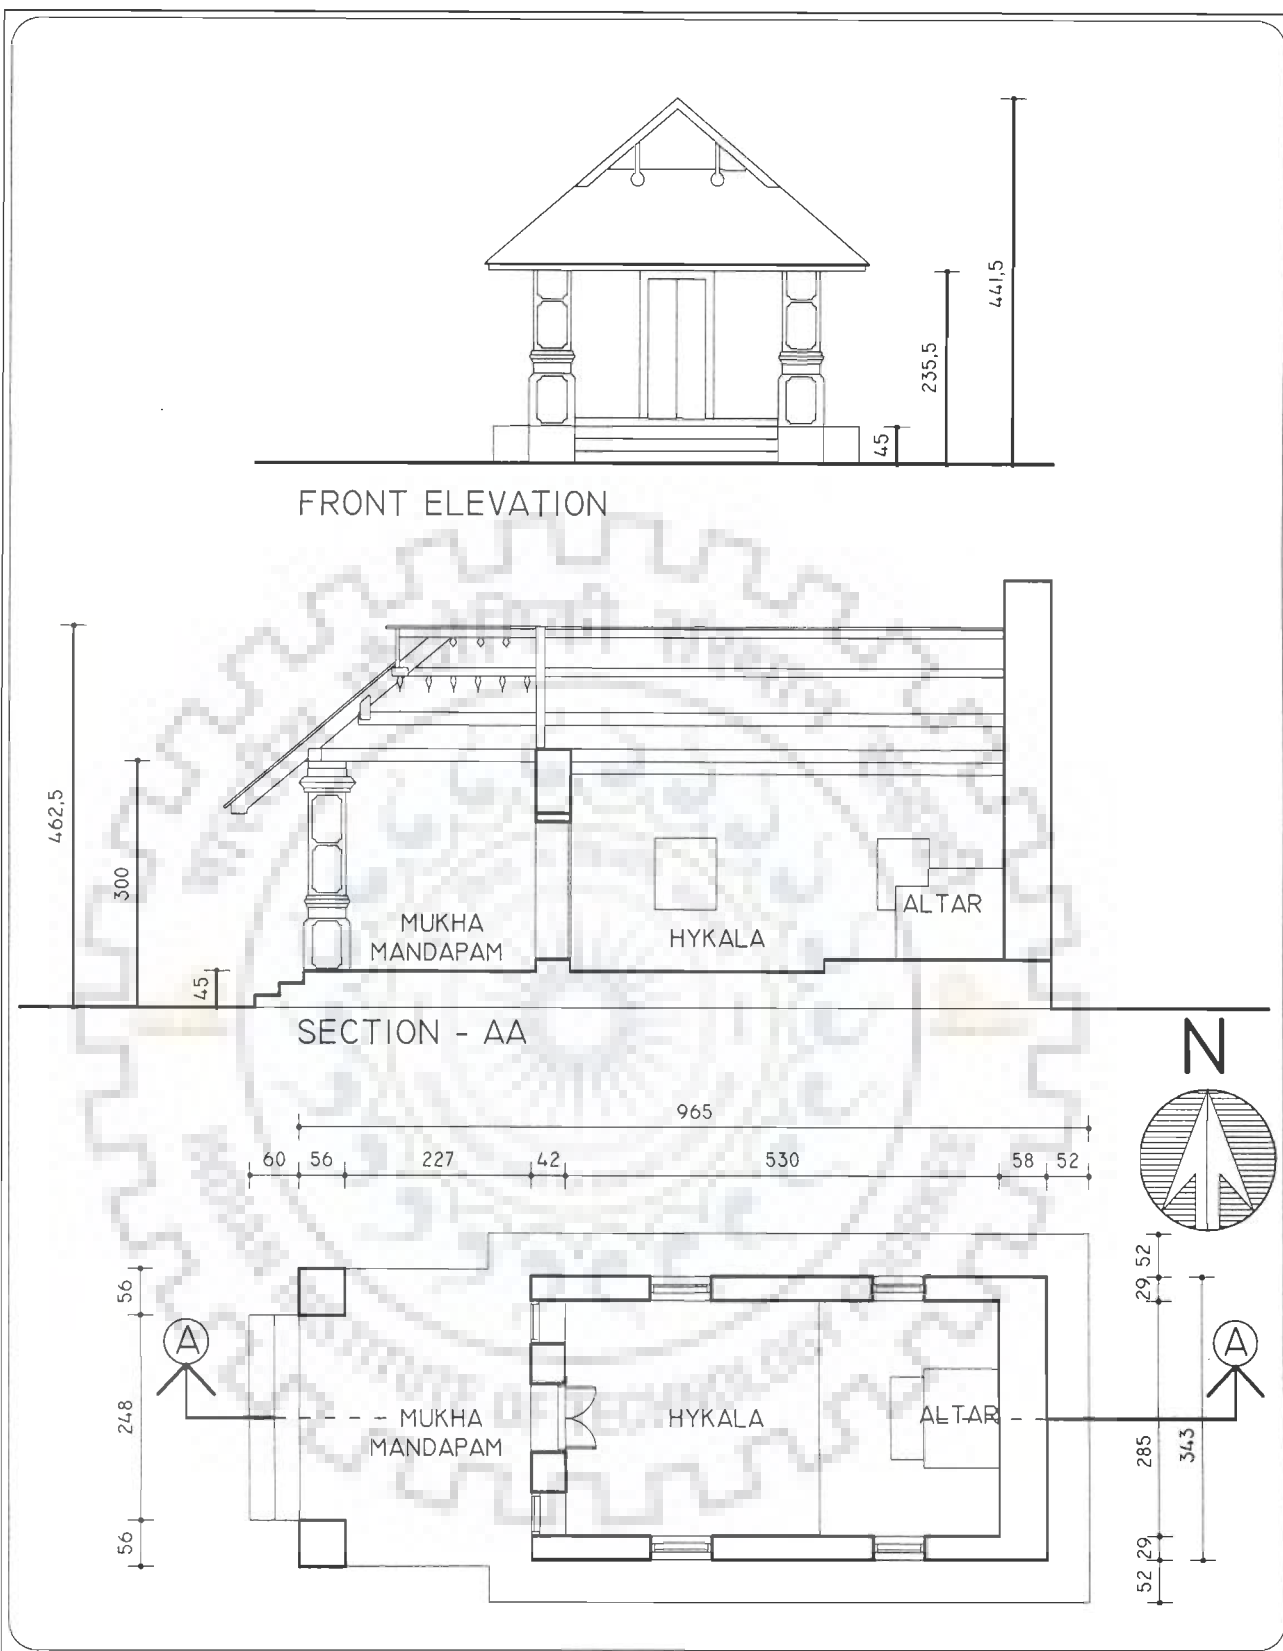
ELEVATION, SECTION AND PLAN MATTOM KURISHU PALLI
